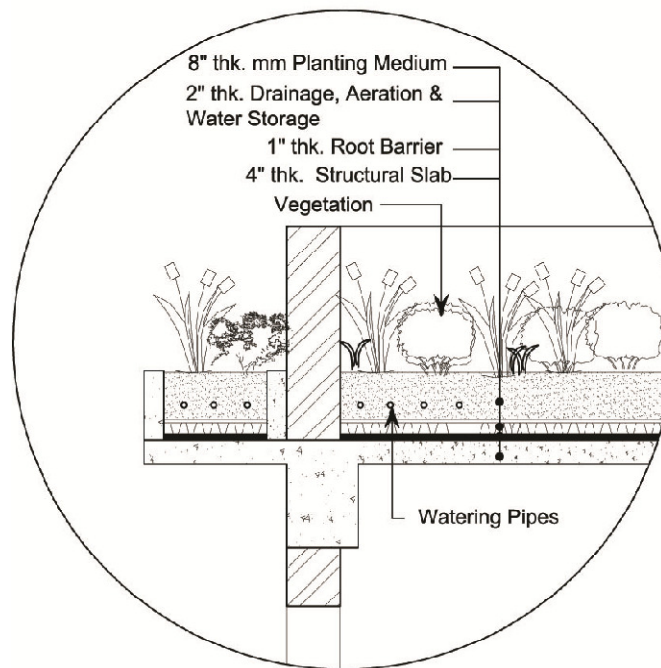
Section of green roof (16" thick) proposed for residential building (scale- 1:20)
